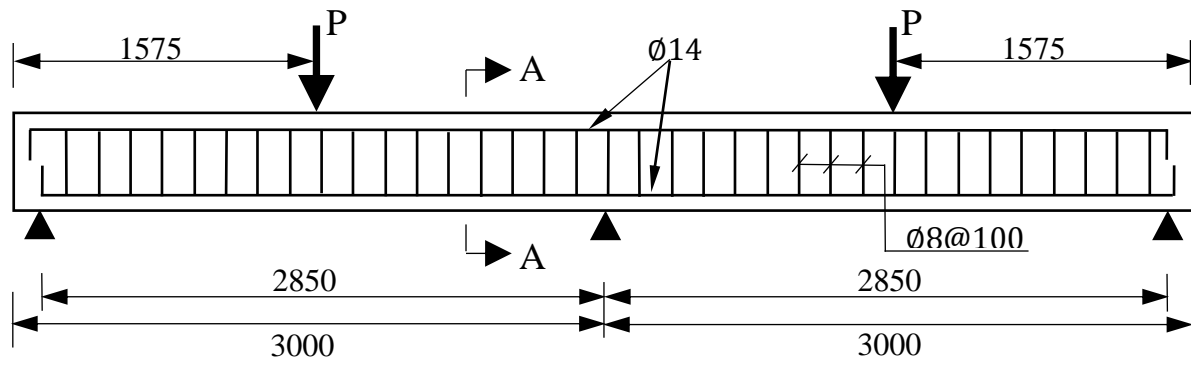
shows the general elevation view of the NSM-FRP specimens and their cross sectional details. Beam CB was tested as a reference beam; it had no FRP reinforcement, while the other beams, namely BC1, BG1, BC2-R, BC3-L and BC4-F were initially strengthened with FRP bars at both their hogging and sagging regions. The hogging-to-sagging reinforcement area that included the NSM-FRP bars was also maintained equal to one in all tested beams. In all cases, the FRP bars inserted in the sagging regions did not extend over the external supports. The beams noted BC were strengthened with CFRP bars while the beam noted BG was strengthened with GFRP bars. The numbers assigned to the beams were used only for organizational purpose.
